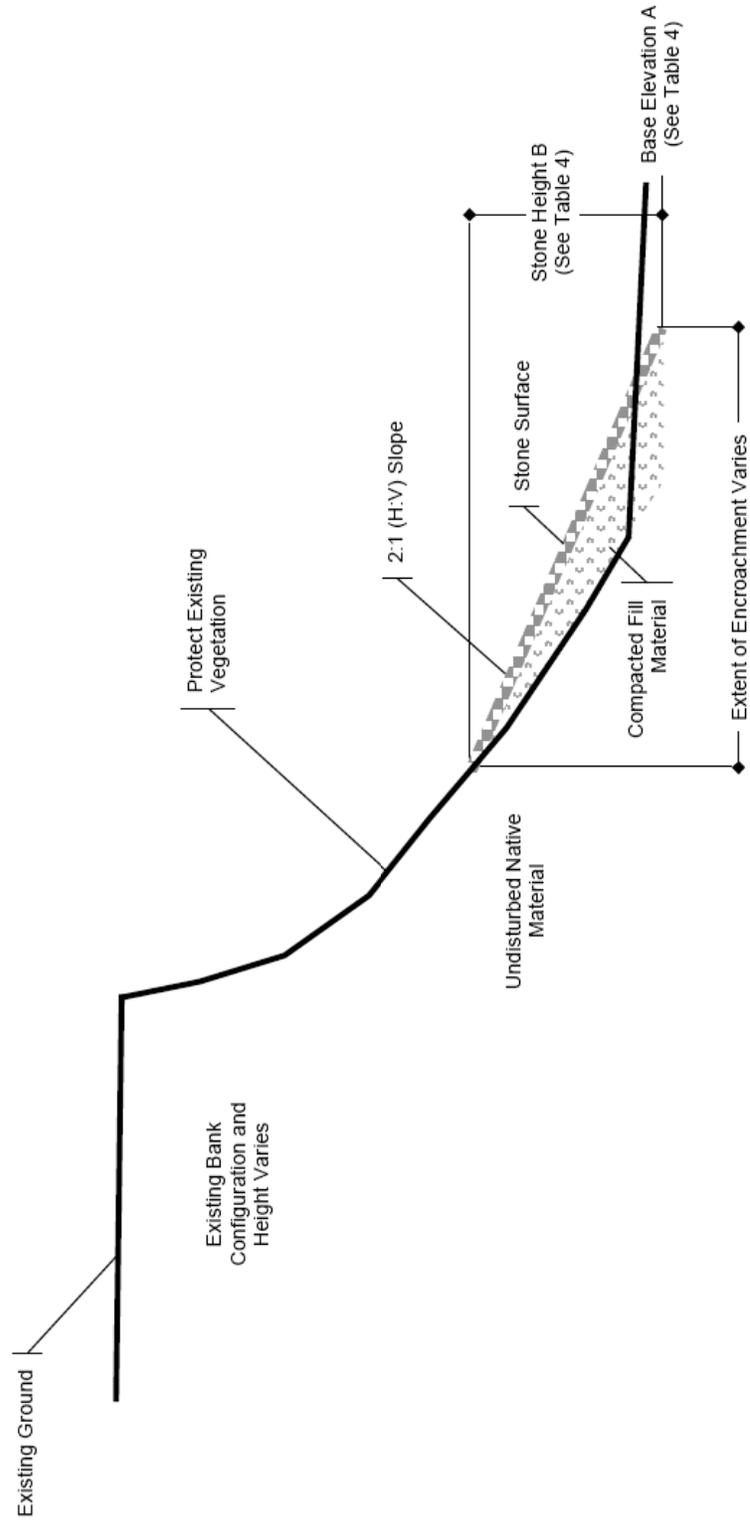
Technique 4: Cross-section of low bench with and without bank slope reduction.
